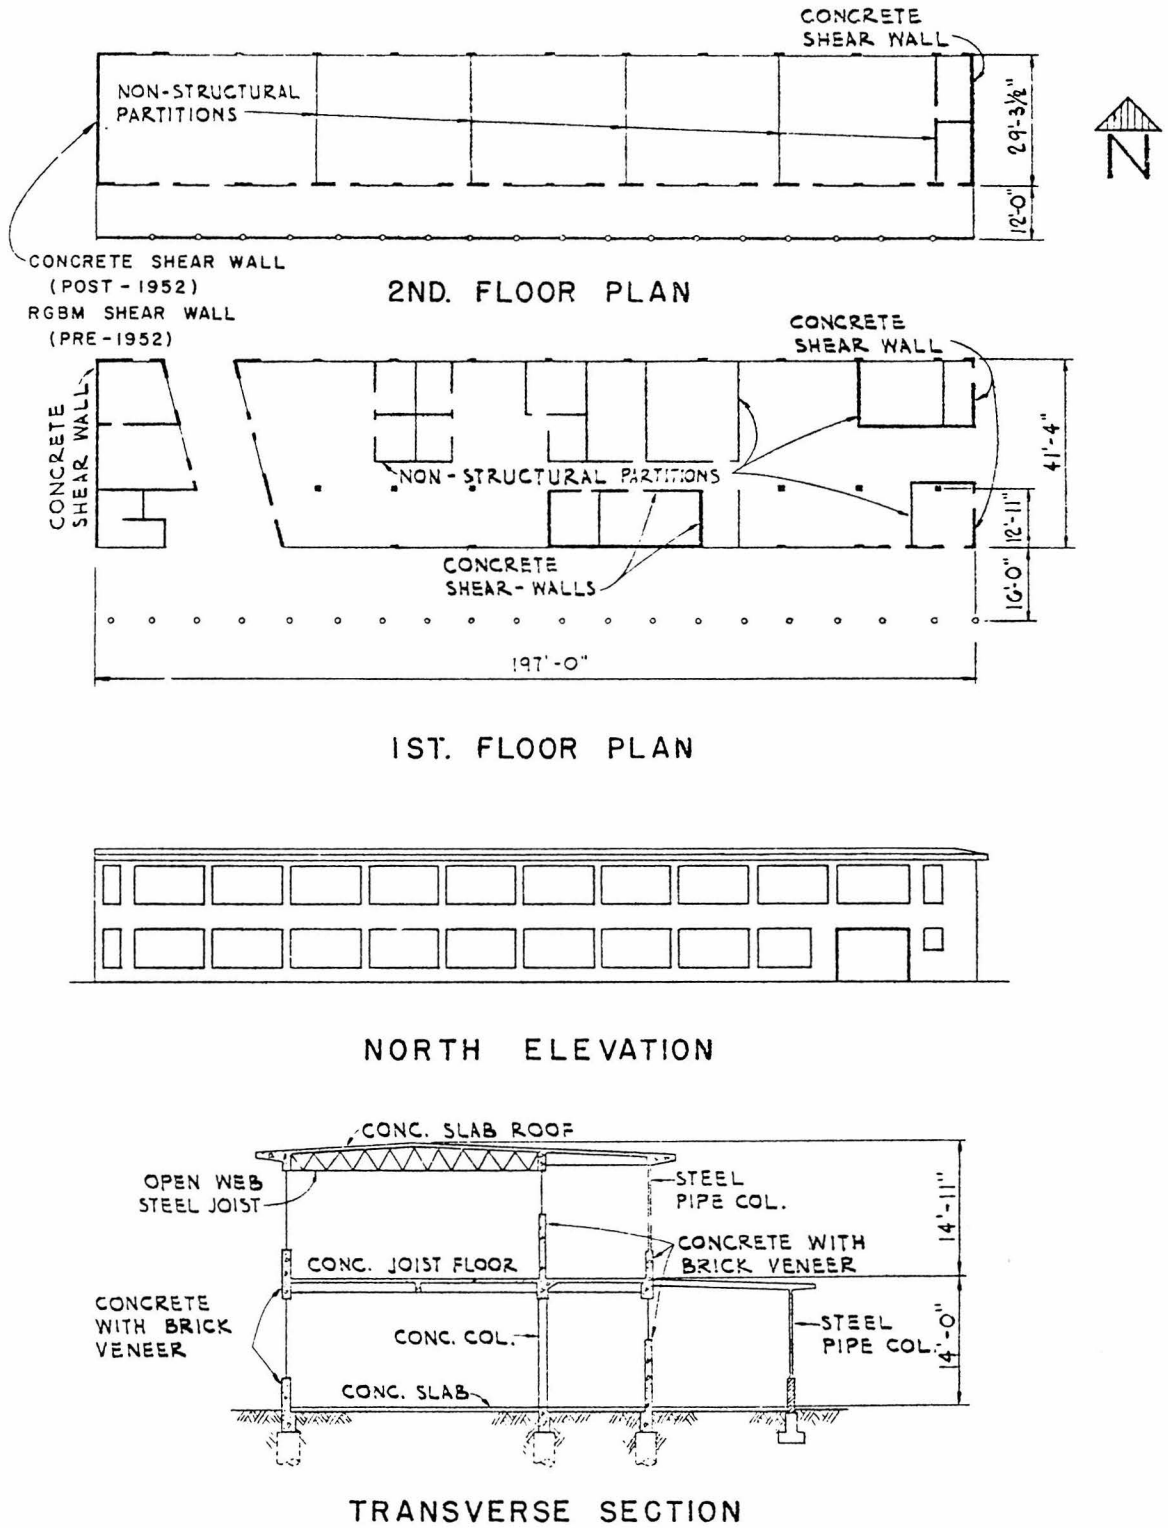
DETAILS OF THE ARVIN HIGH SCHOOL, ADMINISTRATIVE BUILDING (from Blume, et al., 1961).
